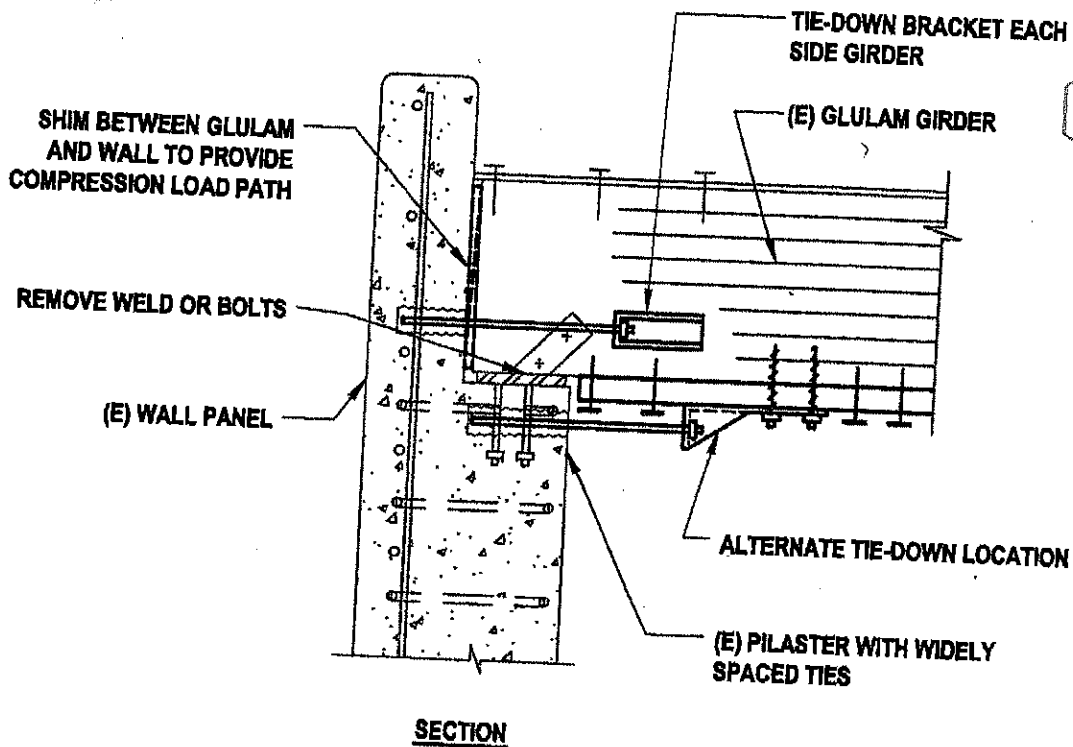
Enhanced Girder Connection at Pilaster
